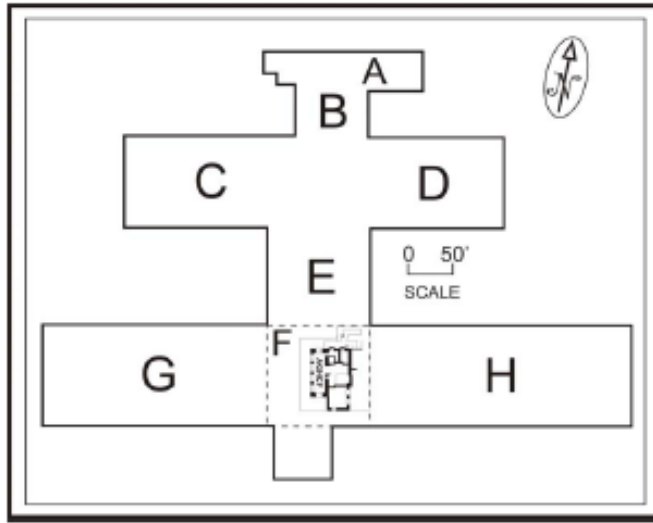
, MRB Schematic Layout, showing location of F Wing and FSMHF
